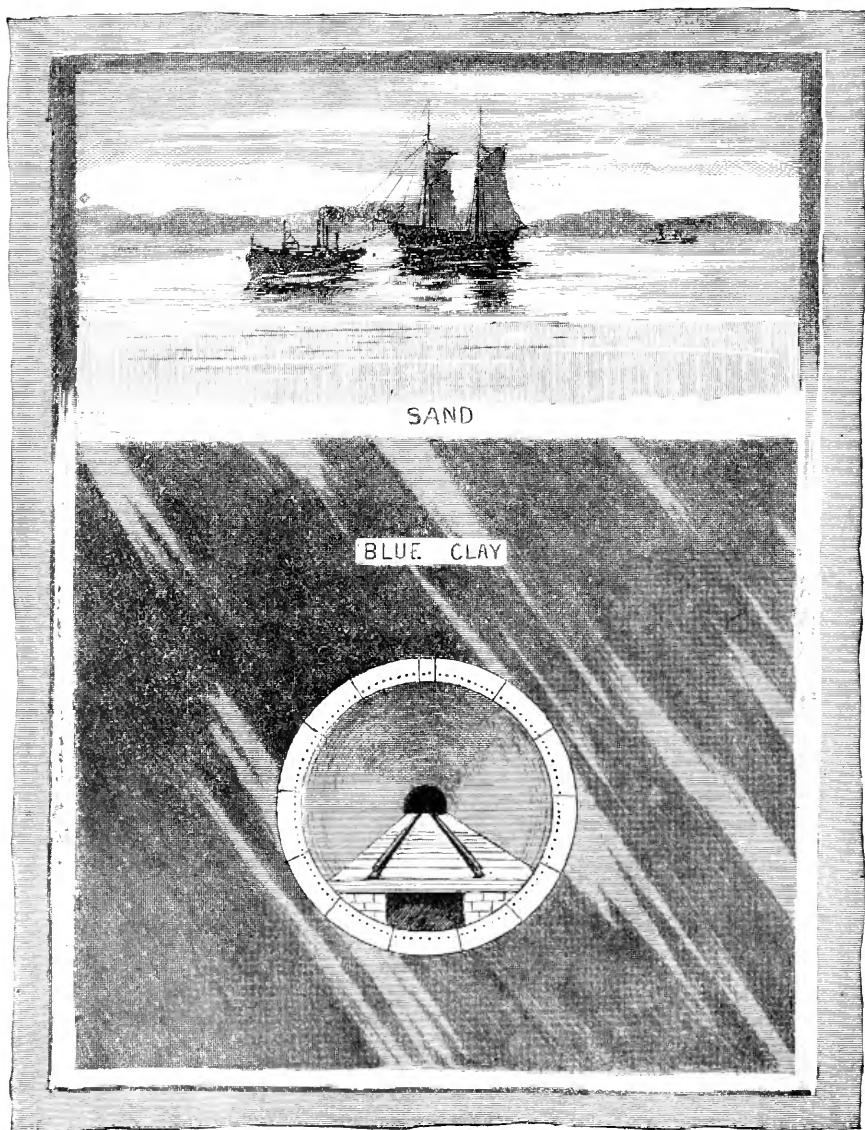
SECTION OF THE TUNNEL AND RIVER-BED.
